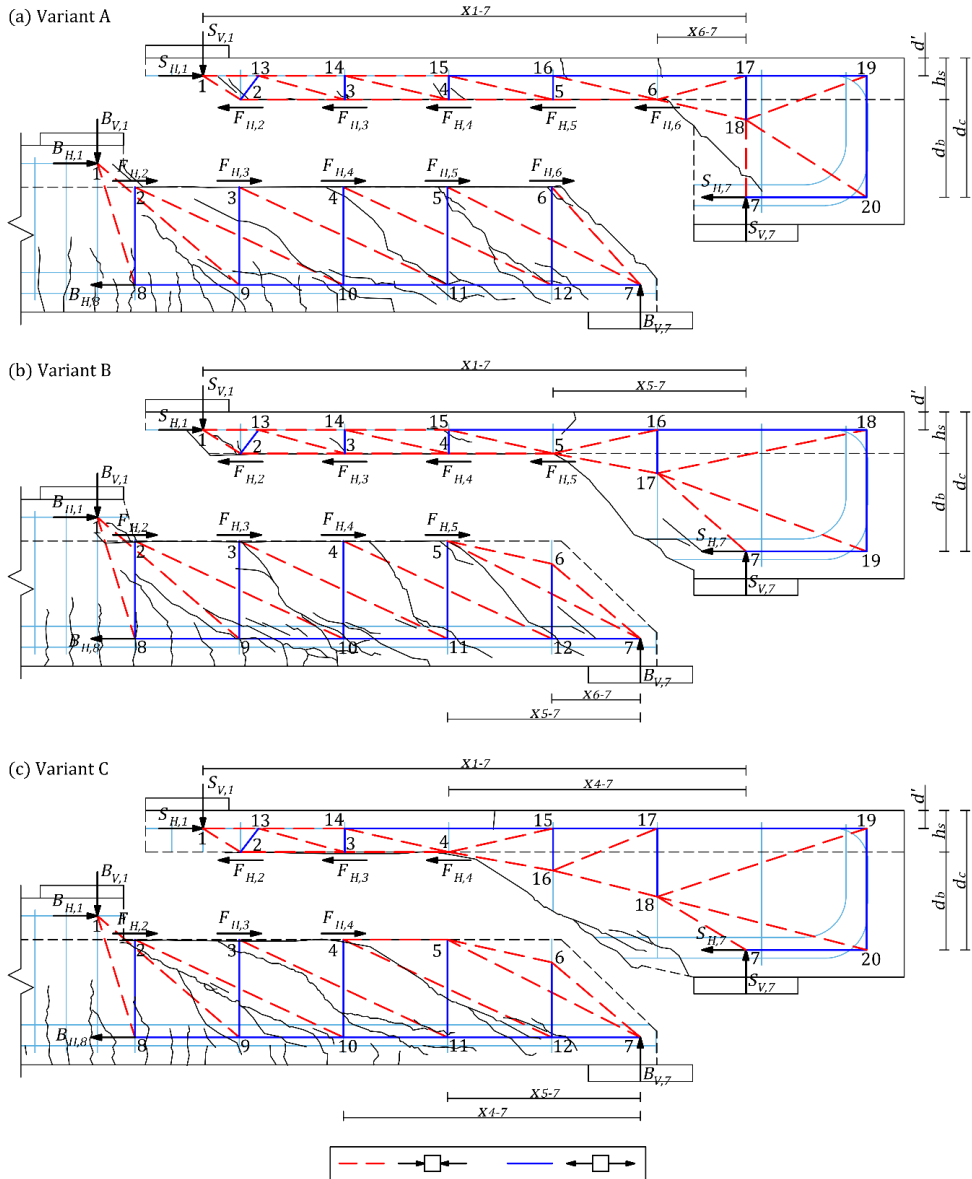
Proposed strut-and-tie models for the precast beam and the cast-in-place slab separately: (a) Variant A (specimen NWP3B2); (b) Variant B (specimen NWP2B2); (c) Variant C (specimen NWP1B2).
